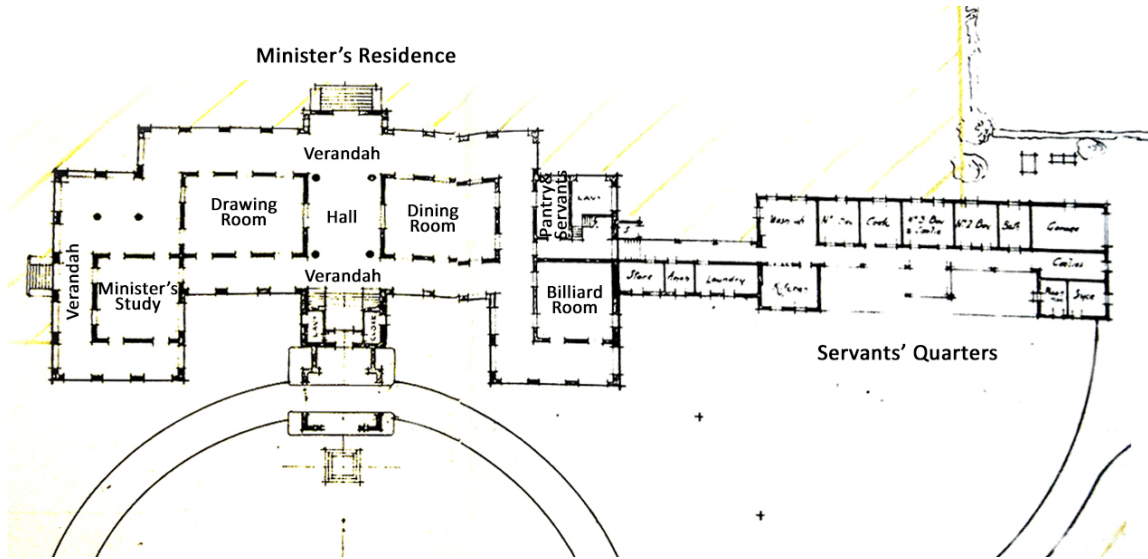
Ground floor plan of the minister's residence, 1924.
